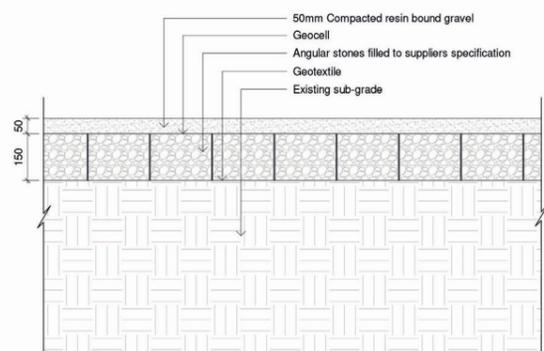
PERMEABLE PATH TYPICAL DETAIL
